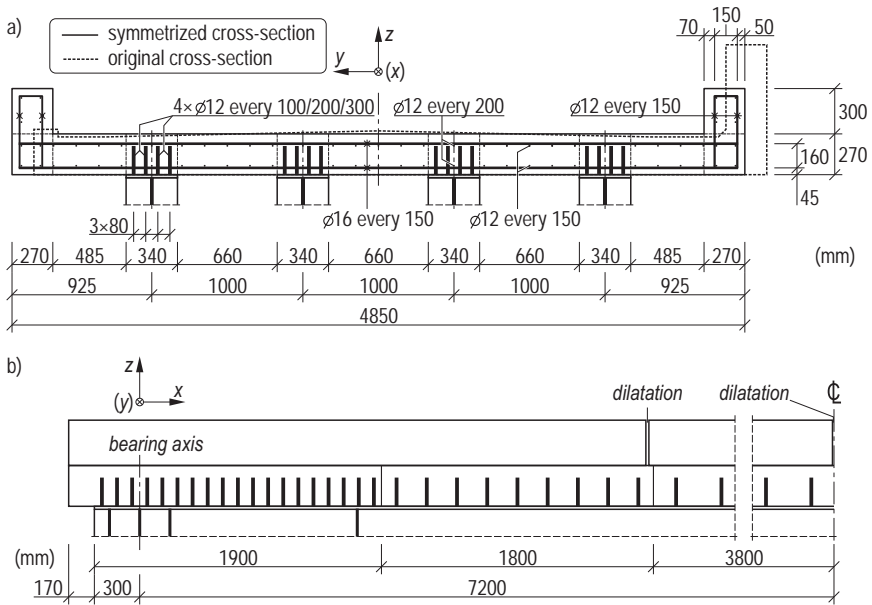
The original and symmetrised cross-sections (a), and the longitudinal section (b) of the KNI 140070 viaduct and the symmetrised reinforcement.
